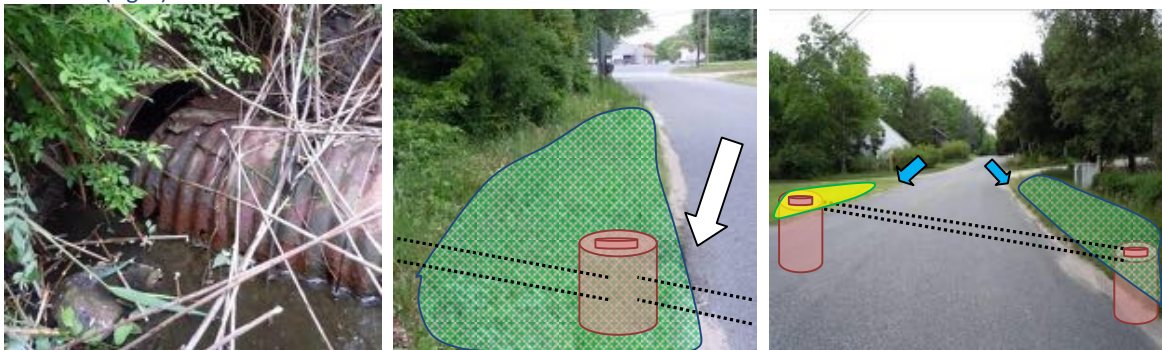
Proposed bioretention area at intersection of Lower Road and Ackerly Pond Lane shown shaded green.
